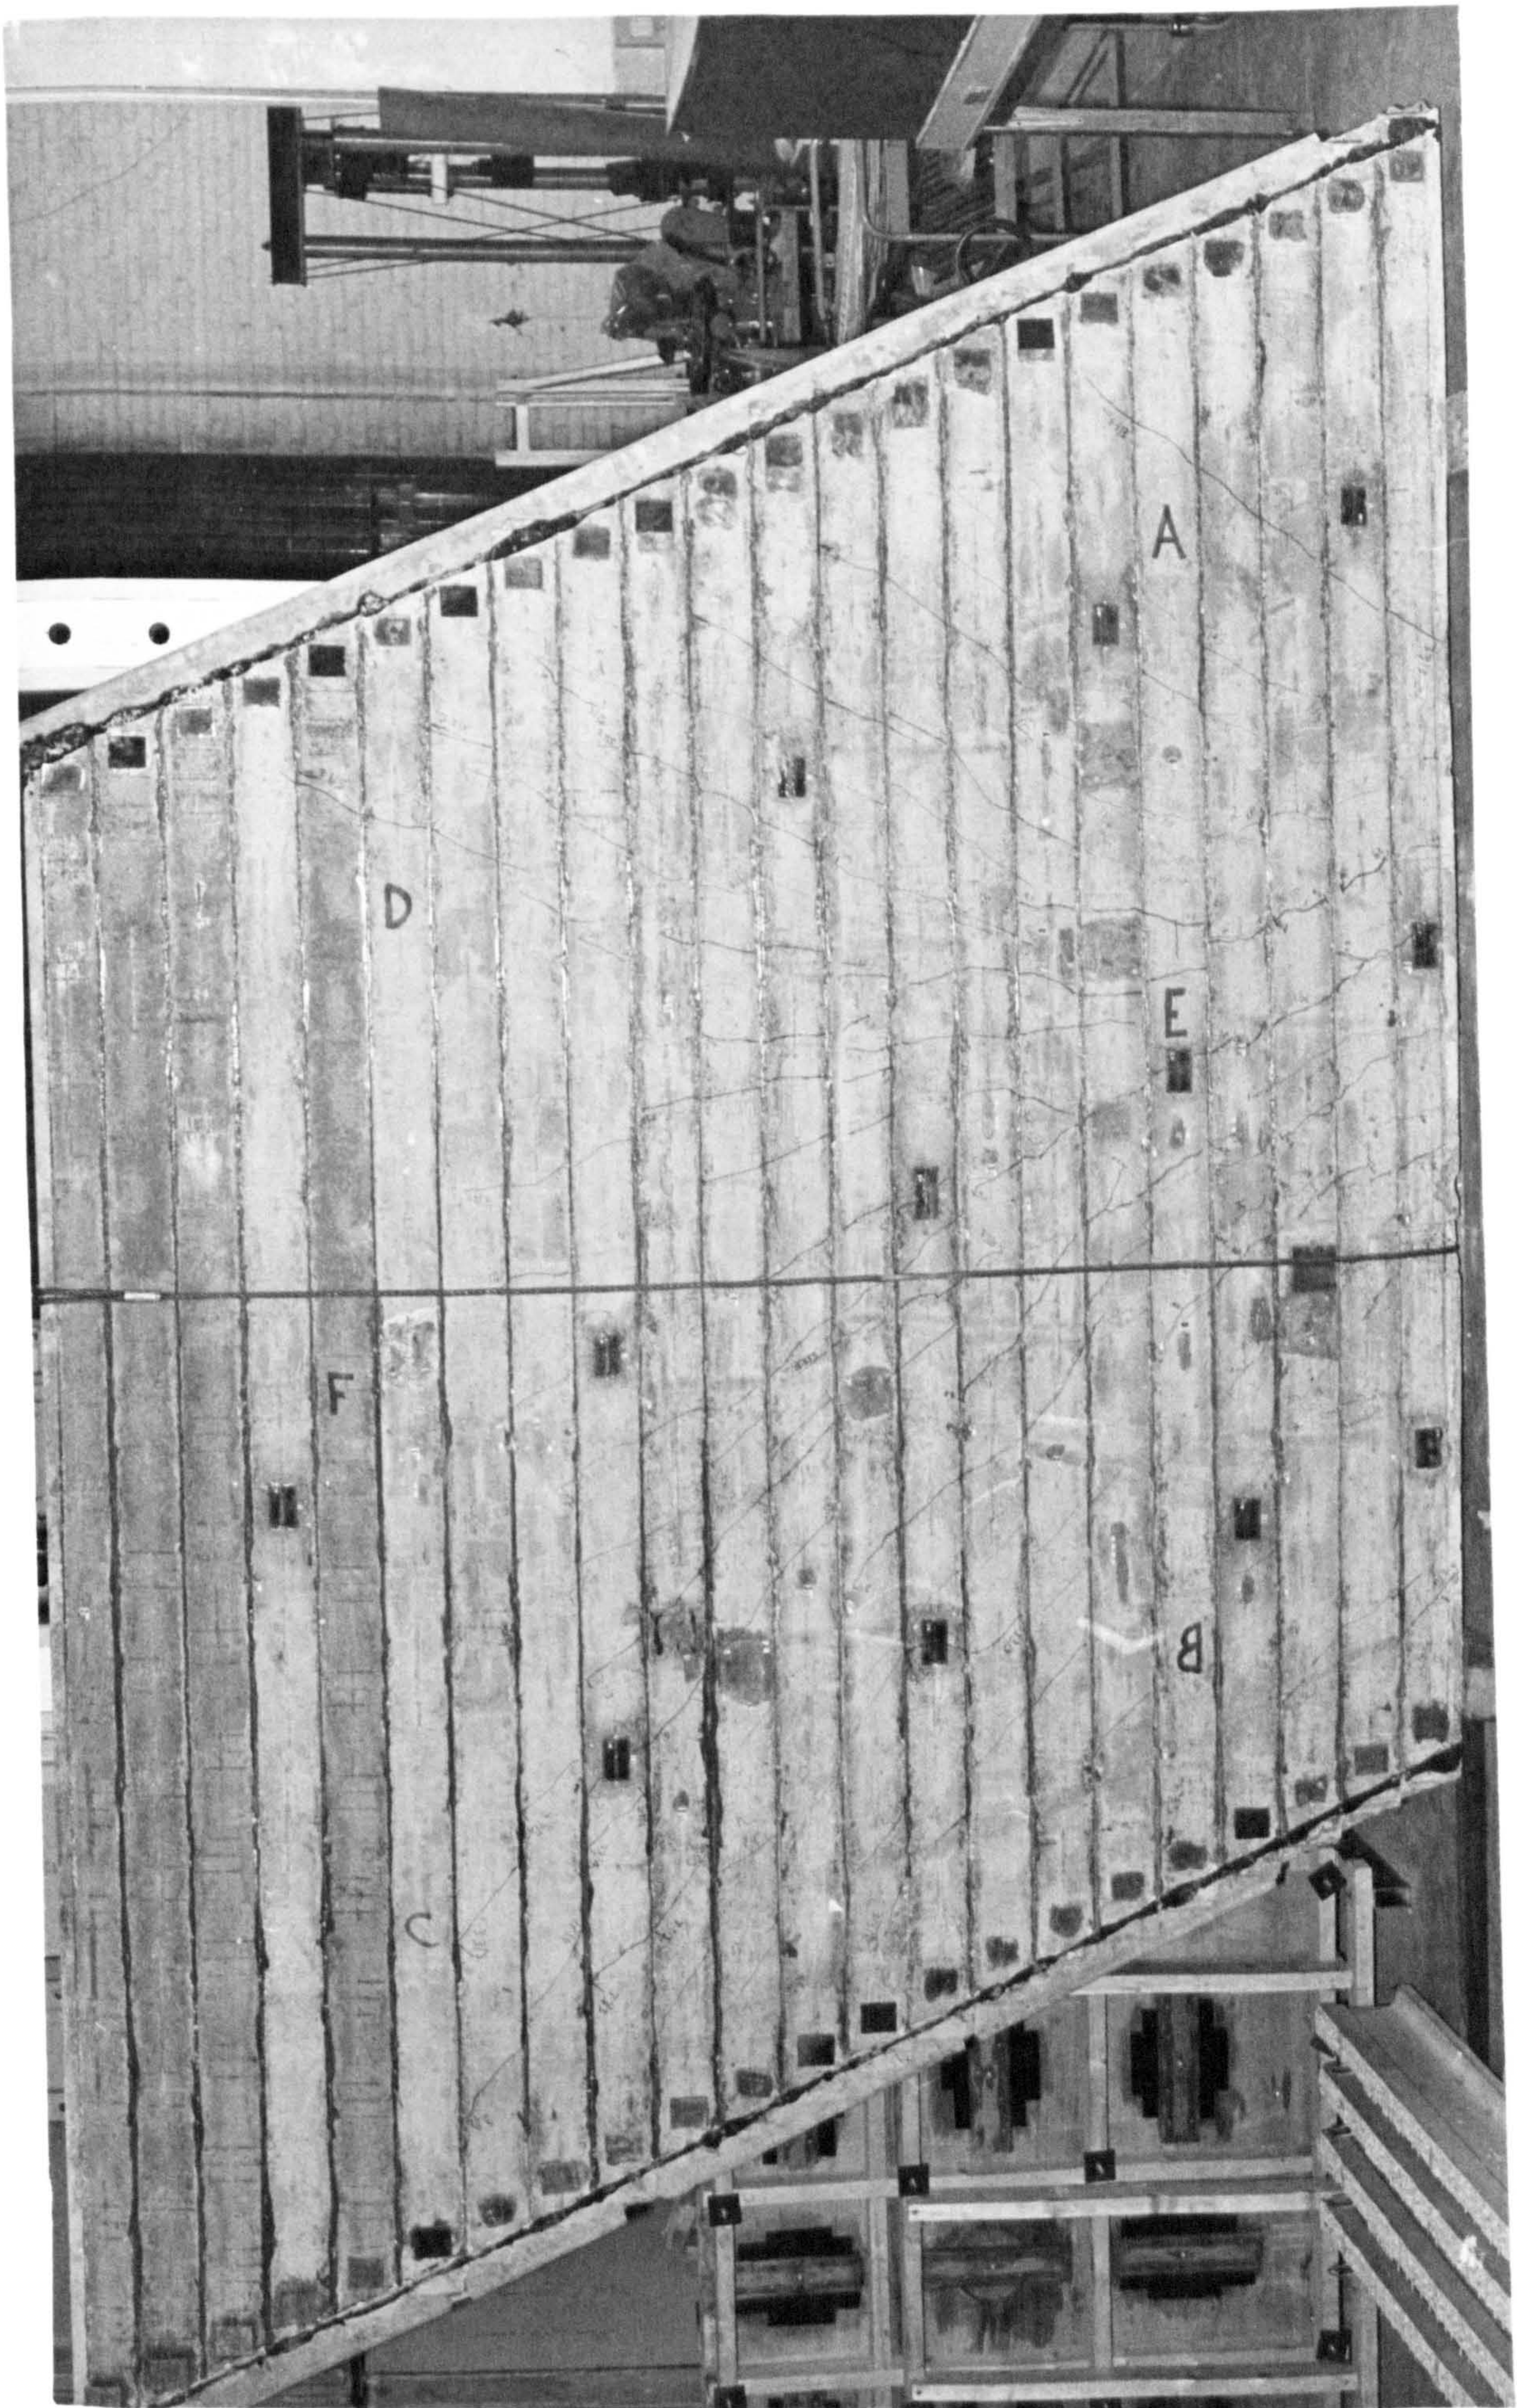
MODEL 1 SOFFIT CRACKING
